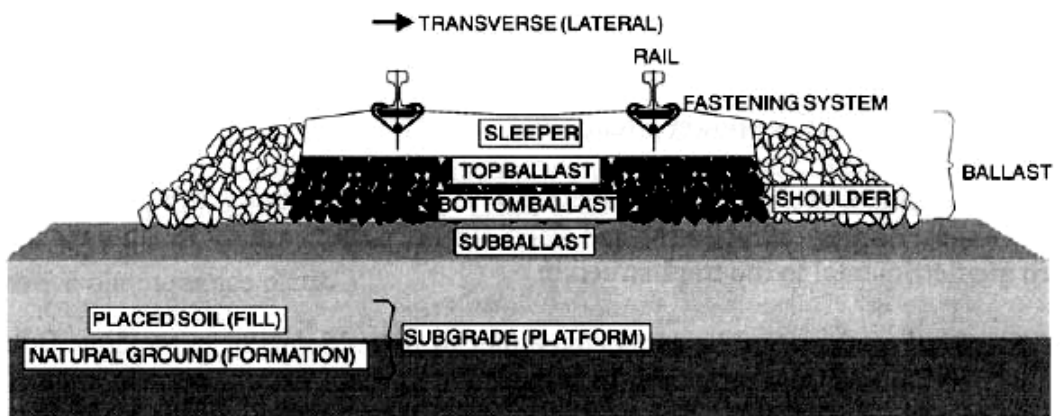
Transverse cross section of ballasted track structure (Selig and Waters, 1994)
